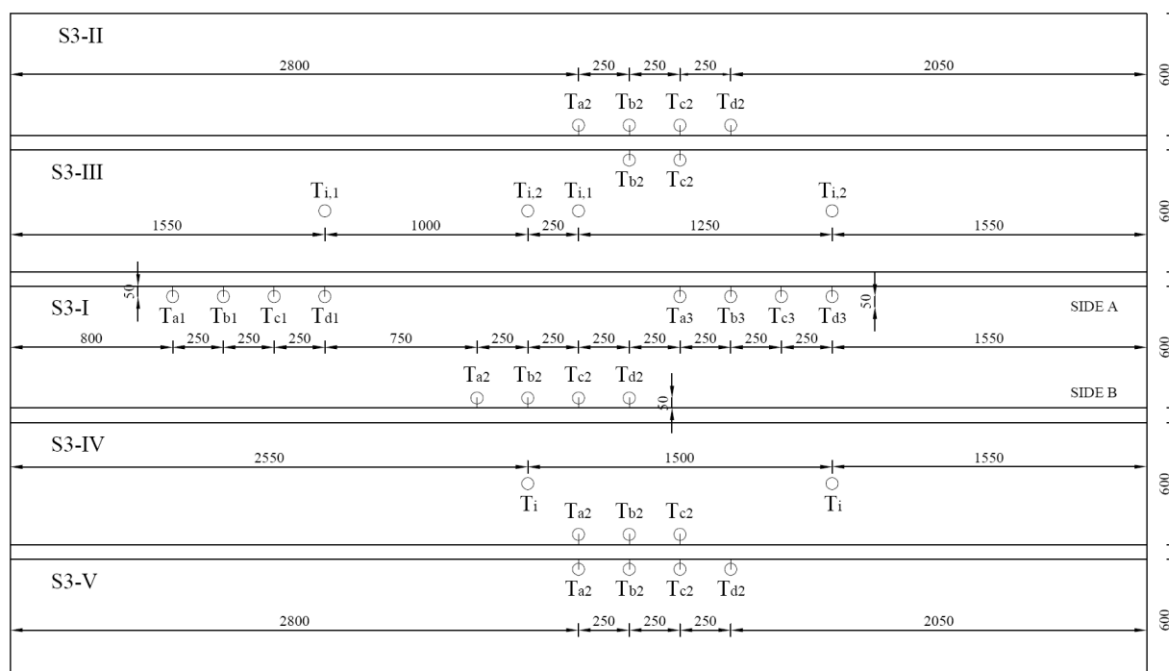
Plane view of specimens during fire test No. 3 with thermocouple layout (dimensions in mm).
